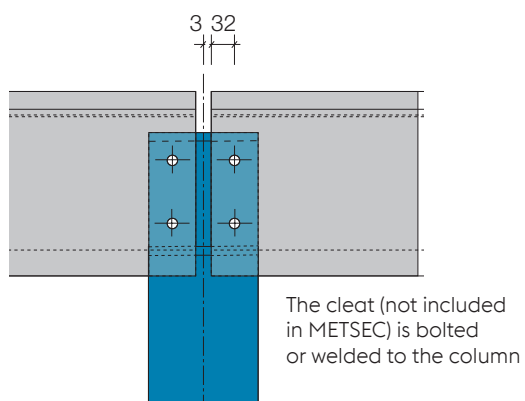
Details of eaves beam fixing to the column of the primary structure
